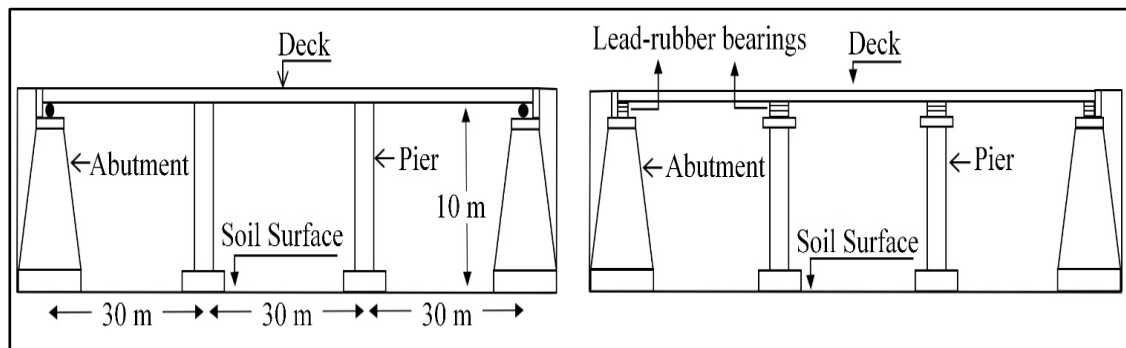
General elevation of the conventional (left side) and isolated (right side) bridge in this study
